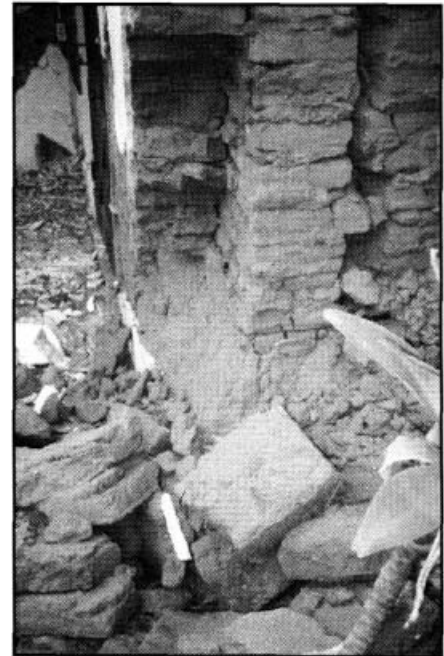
Detail at the base of the northwest corner of the kitchen shown in Figure 5.5. Previous moisture intrusion reduced the strength of the adobe, which developed a slip plane along which the outer section of the wall collapsed.
